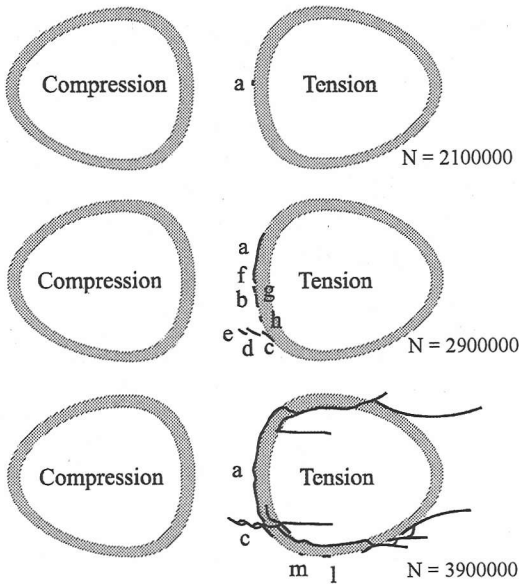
Fatigue crack development of the specimen KF-10
